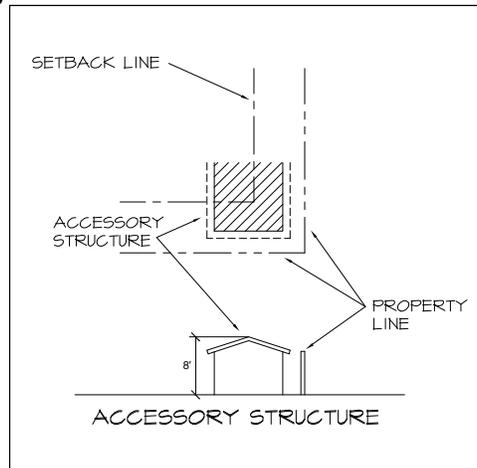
C3. ACCESSORY BUILDING ENVELOPE EXAMPLE
